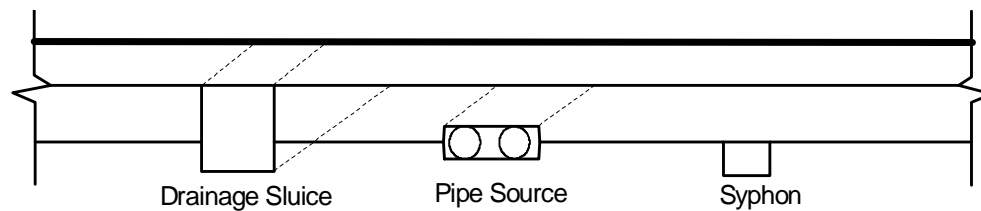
A schematic view of Drainage sluice, pipe sluice and syphon on embankment
